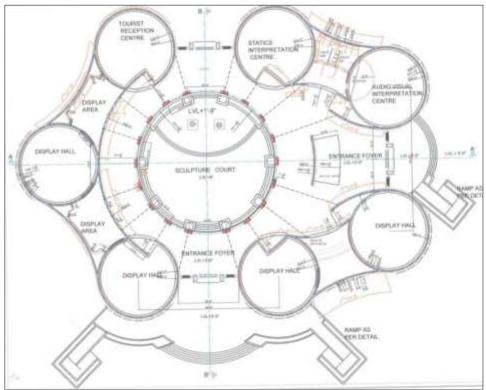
Layout plan of Saka Chamkaur Di Garhi
